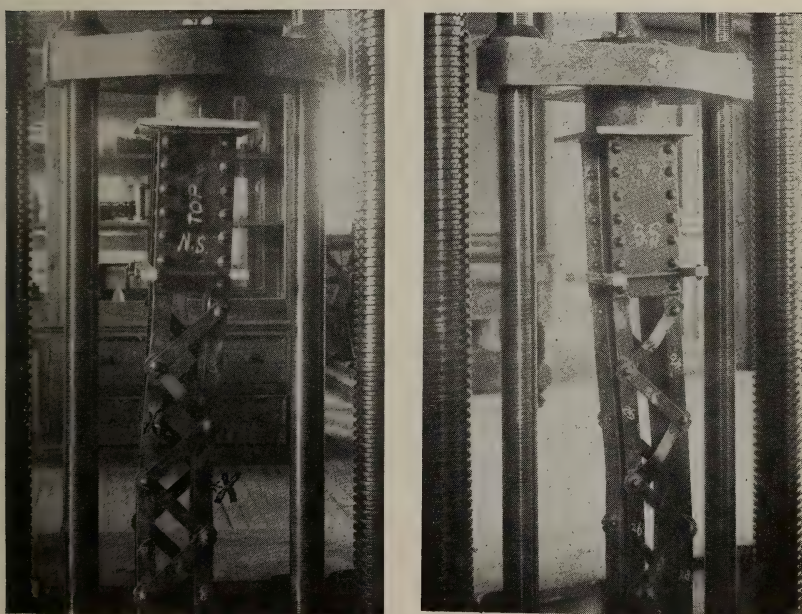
Column in position, showing machine bed in lower photo and column head (floor above) in upper photo.
